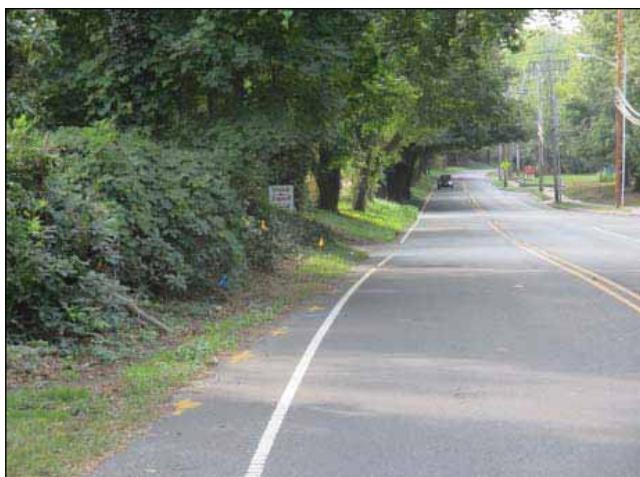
Kings Highway East depicting a lack of sidewalks along the road frontage
